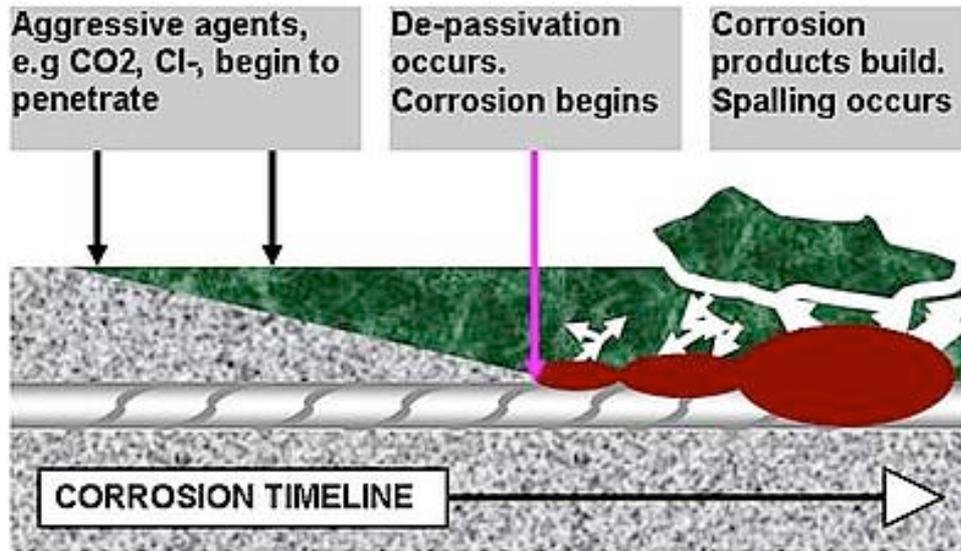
Schematic showing timeline of concrete spalling due to steel corrosion.
